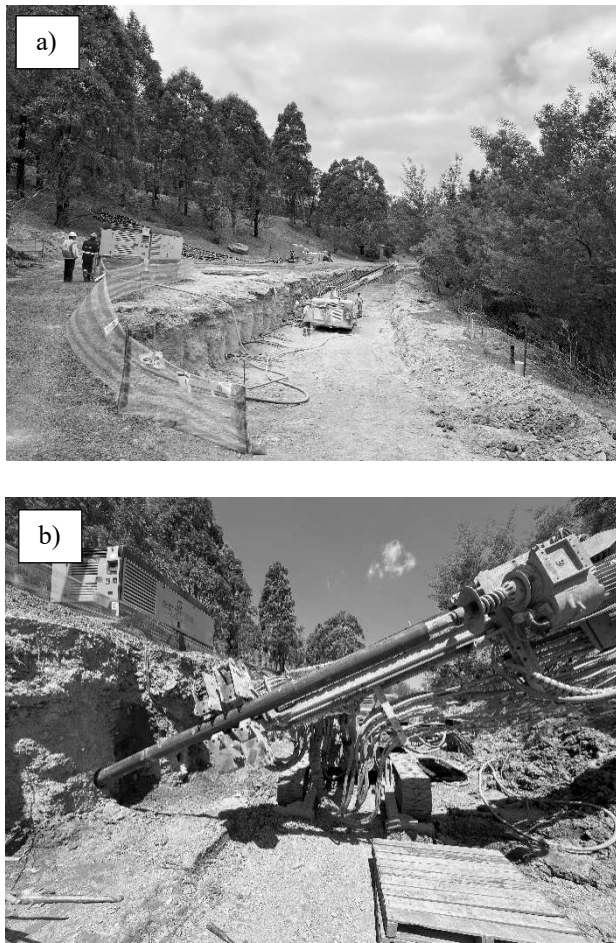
a) Anchor drilling and installation, b) drilling of cased anchors.
